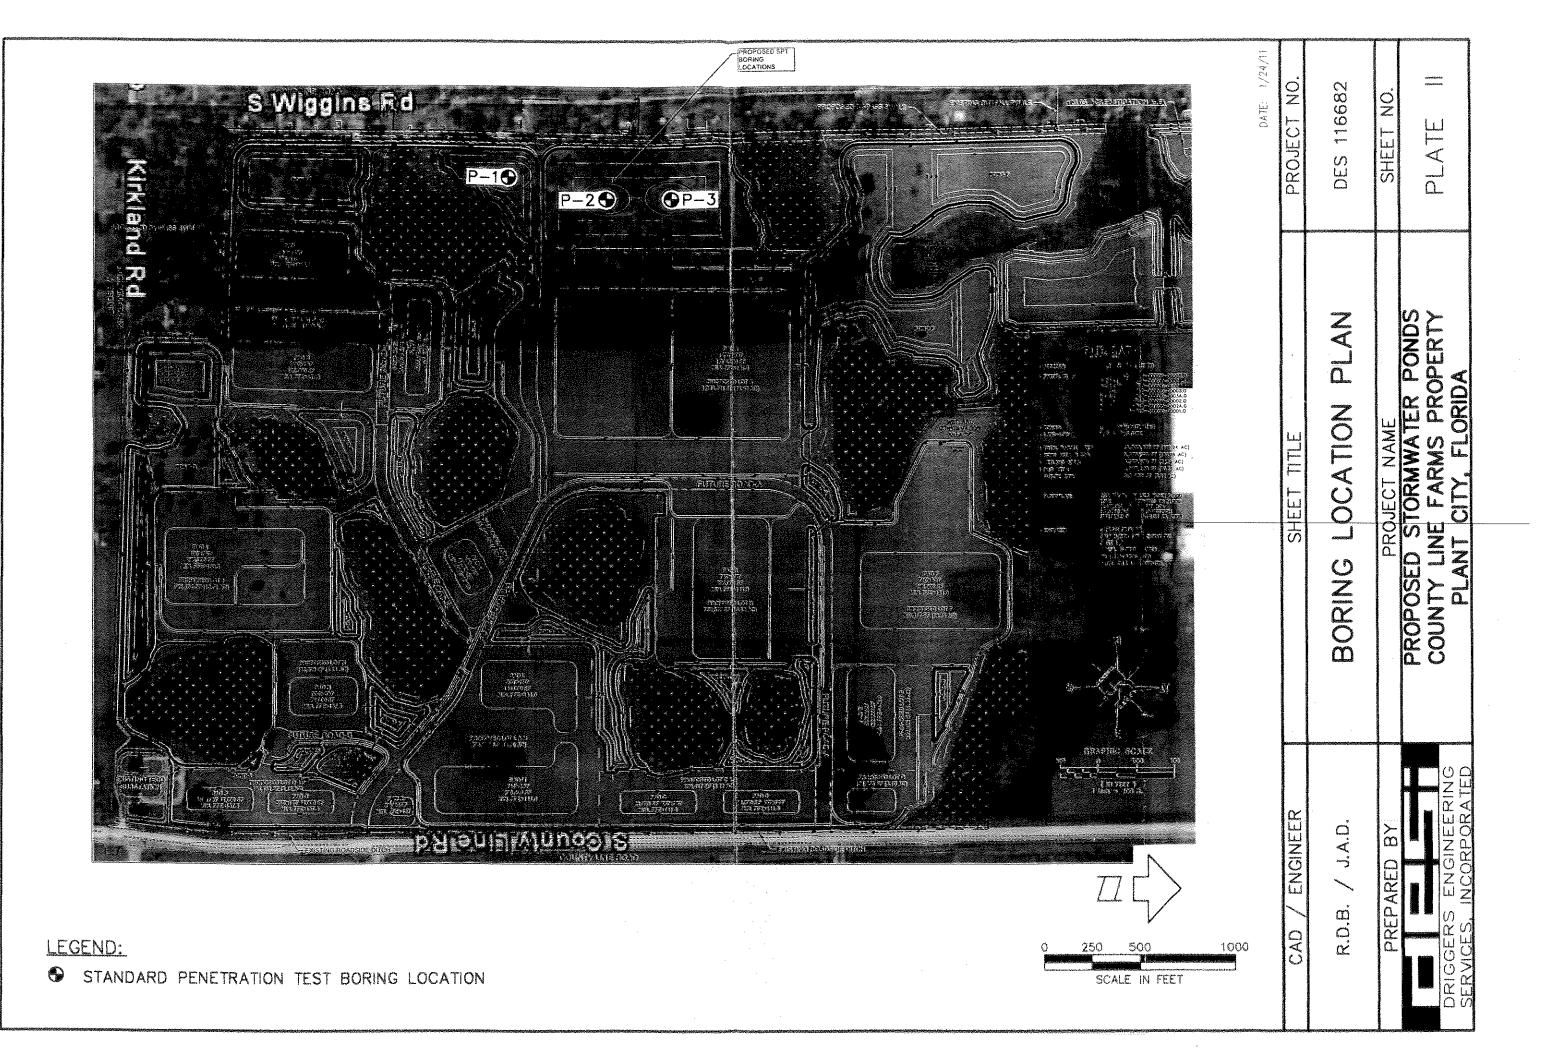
PLATE II - BORING LOCATION PLAN (CURRENT STUDY)
